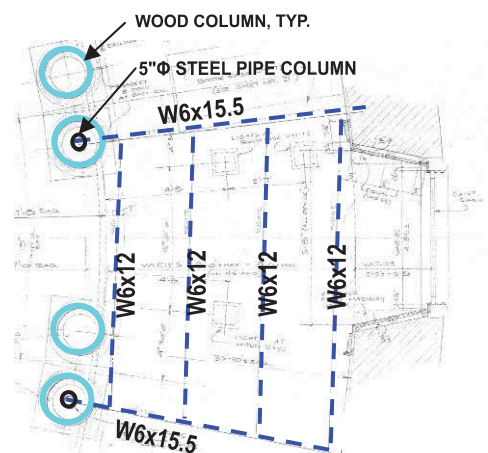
Architectural partial plan of the 1970s steel pipe columns and Middle Gallery beam connections. (Ballou & Justice, 22)
